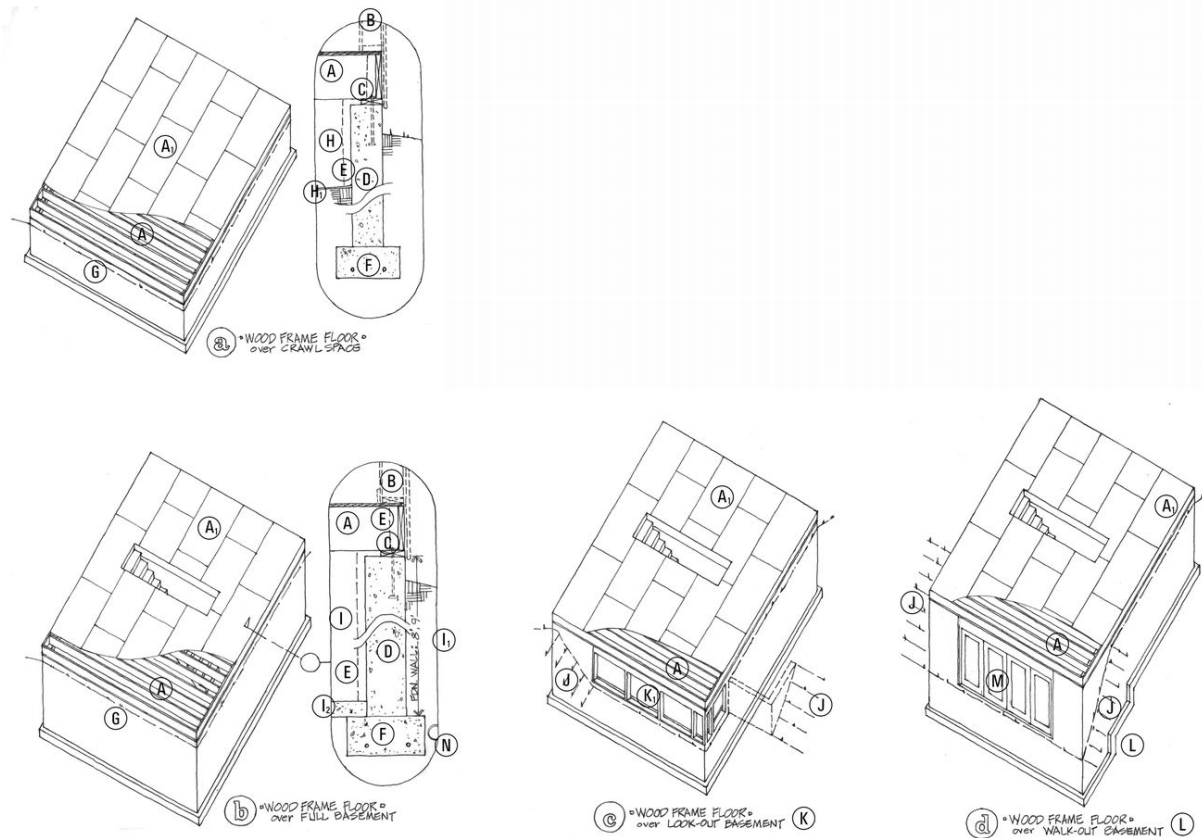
Another type is a wood platform that sits off the ground (on some type of foundation wall). It can sit off the ground far enough to form a crawl space or a basement as shown. [Figure 1-6a](#) also shows a basement foundation.
